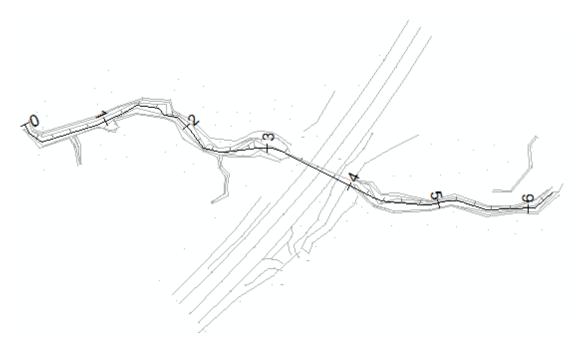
Longitudinal profile stationing for existing and proposed conditions
